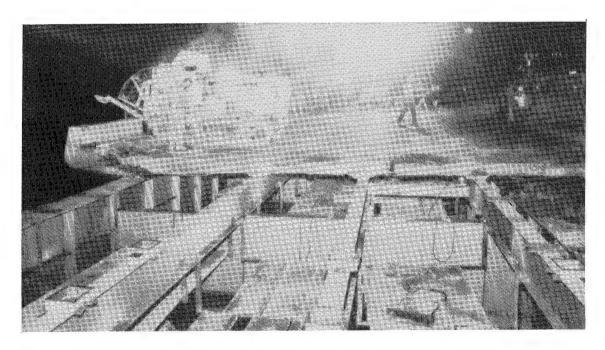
Painted steel and forms for bearing pads placed on stringers in section where concrete has been removed, Woodrow Wilson Memorial Bridge (from ASCE 1984)
